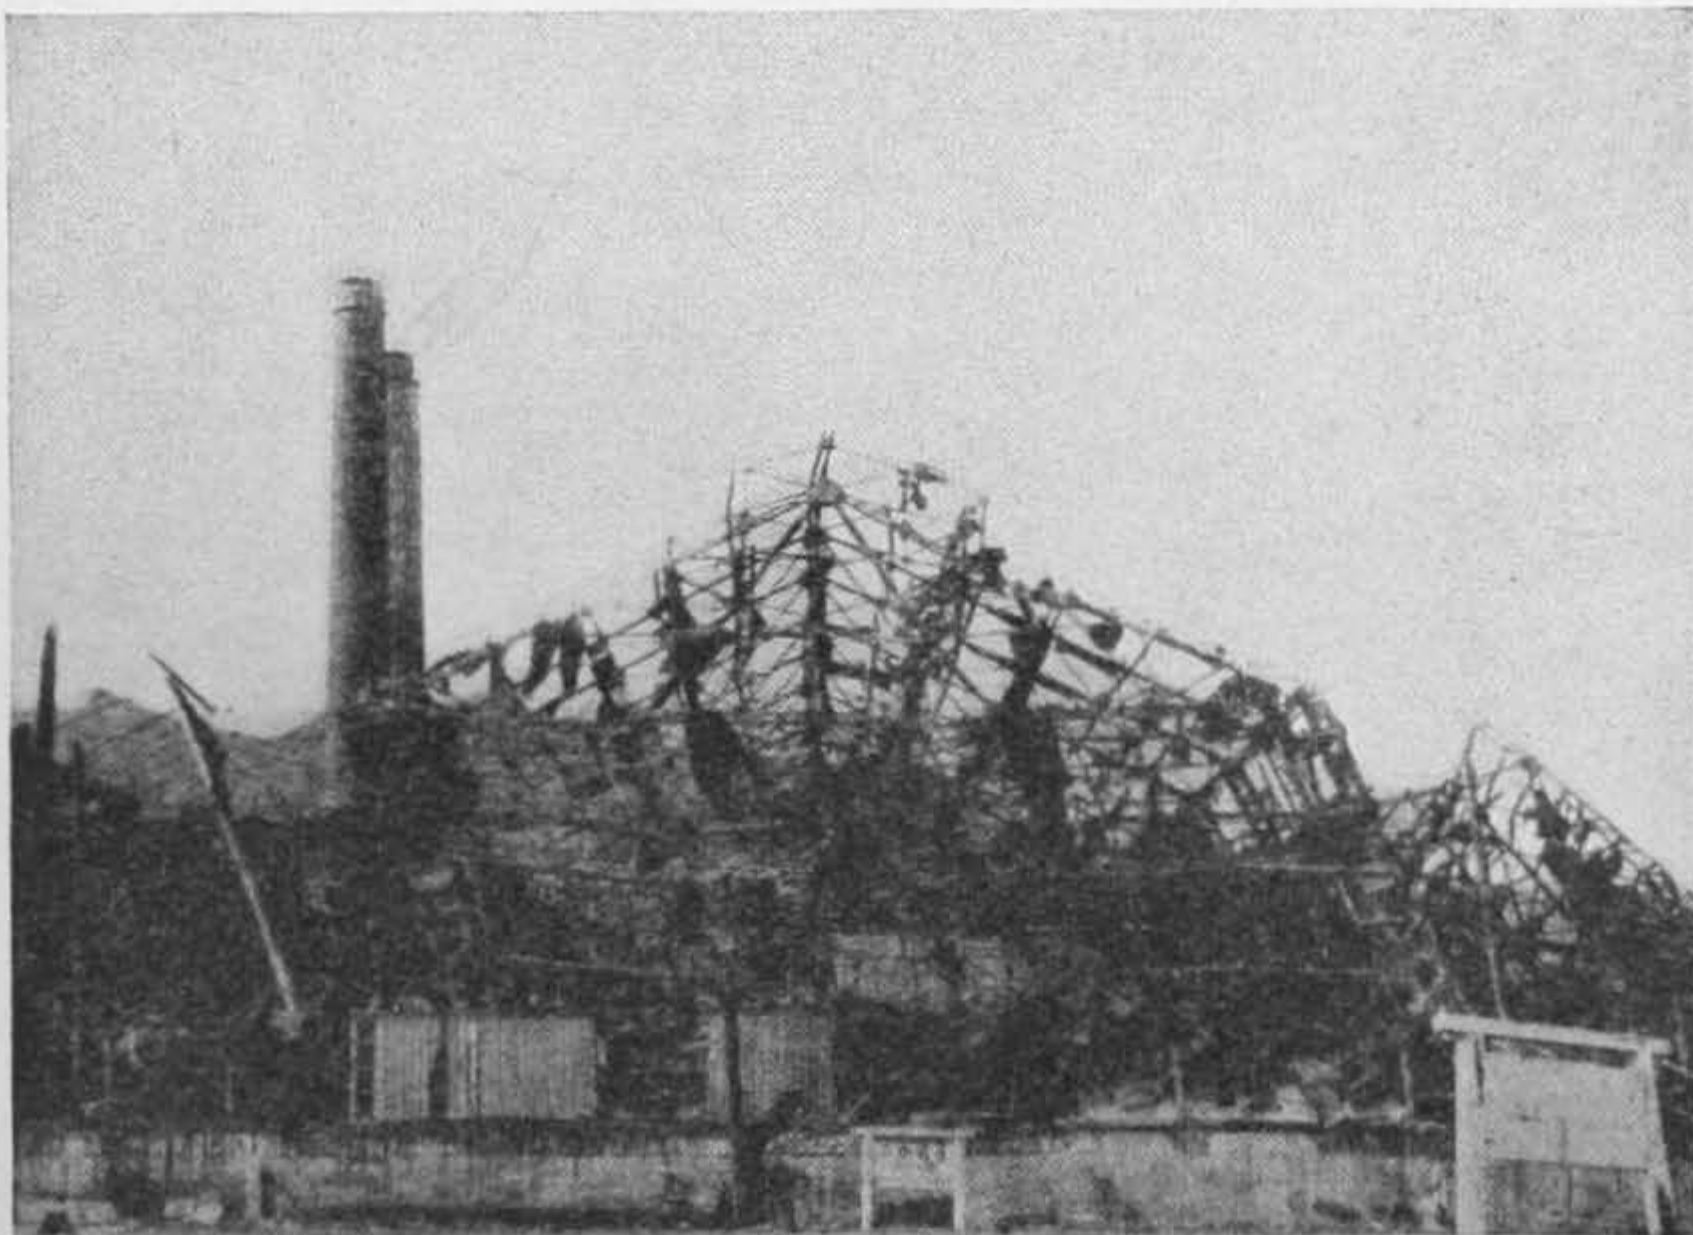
N A G A S A K I . Mass distortion of steel framed shed buildings about half a mile from the centre of damage, which was to the right of the buildings in the photograph. It will be seen that the entire main frame is seriously distorted away from the explosion.
